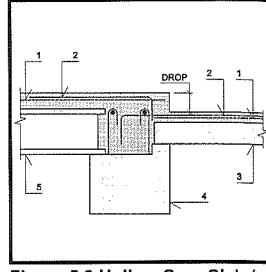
Hollow Core Slab / Beam/ Plank Connections With Drop
